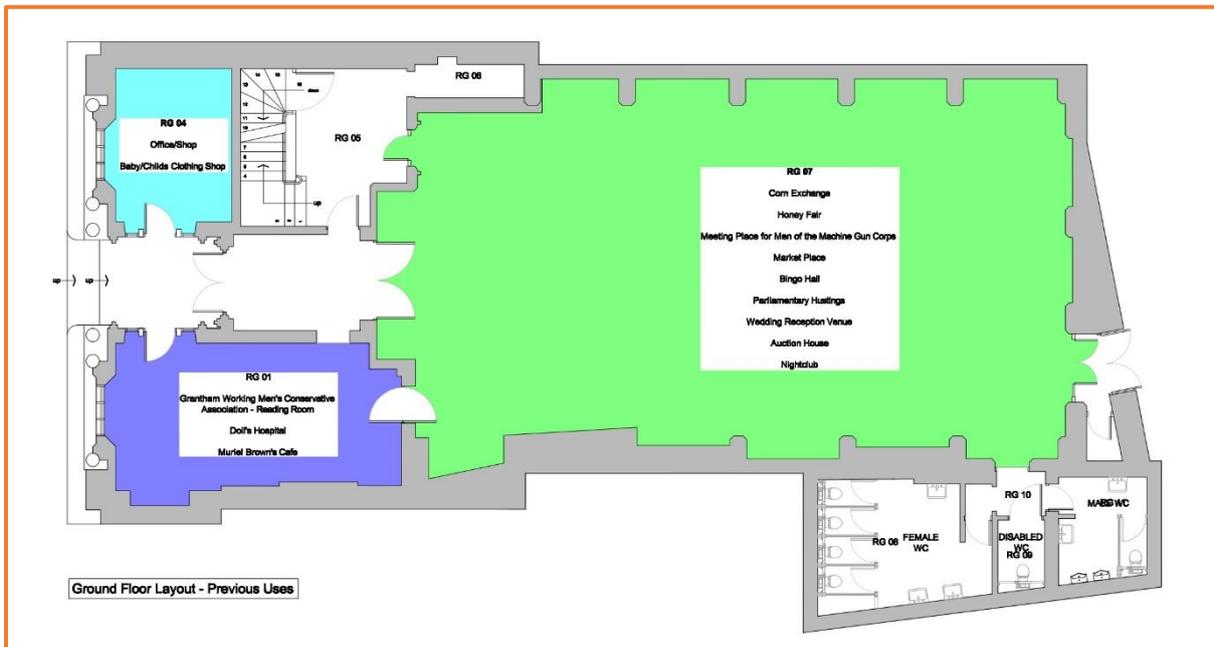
The Ground Floor layout labelled with the previous uses of each room/area.
